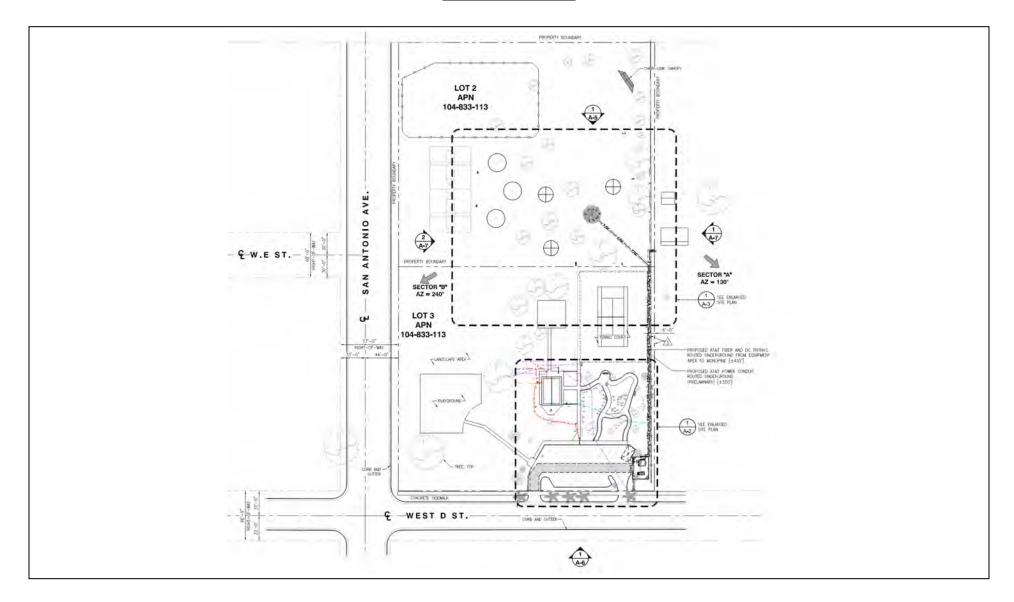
Exhibit C: ENLARGED SITE PLAN (EQUIPMENT ENCLOSURE LOCATION)
